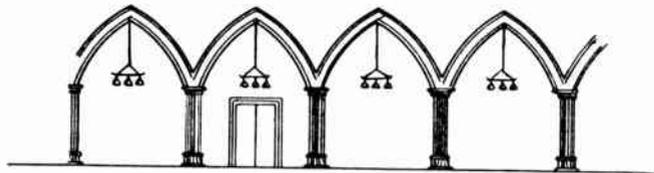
SHOWING ELEVATION TO AISLES. With pendants hanging from aisles as in Scheme B.
